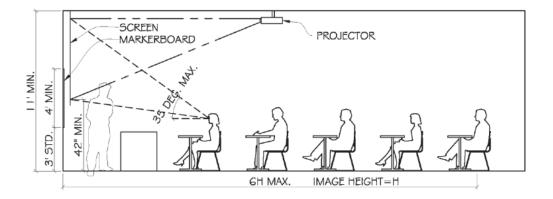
Flat floor Section with Standard Measurement (UIT, 2020)
